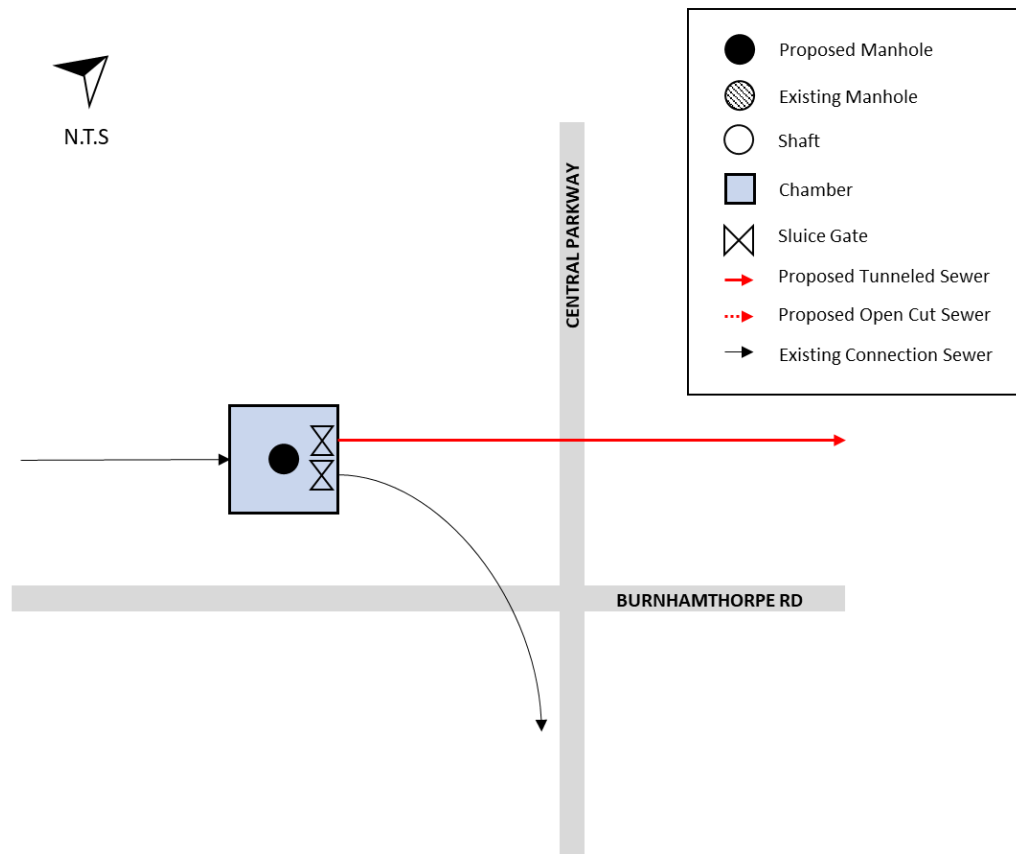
Burnhamthorpe Road and Central Parkway Connection Type Schematic
